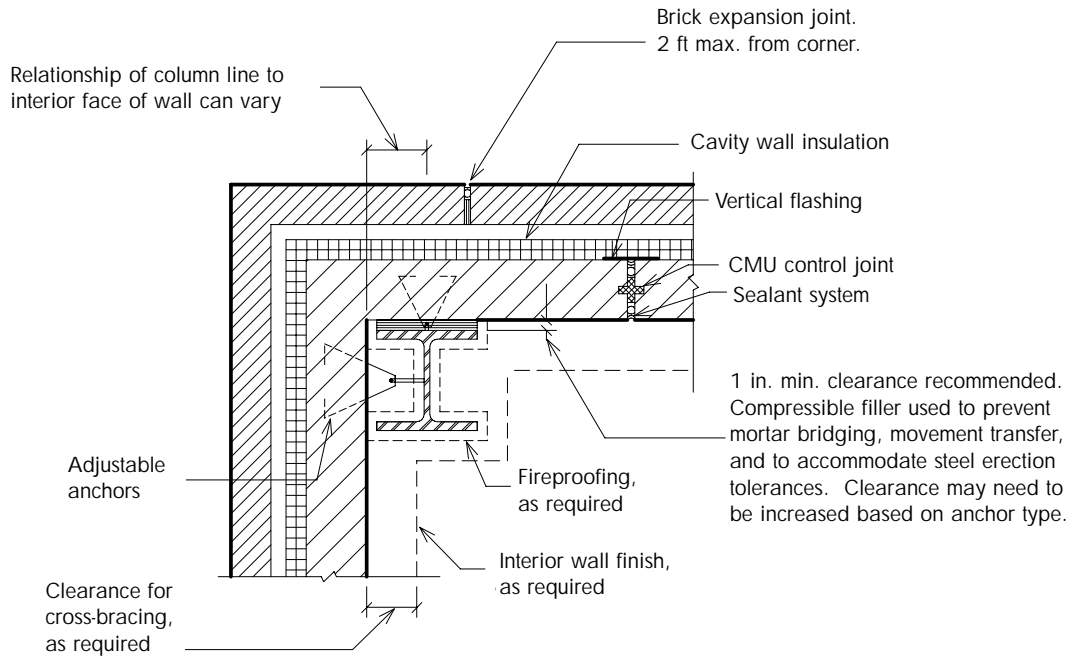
Detailing Considerations for Masonry (Plan Detail at Masonry Corner)
